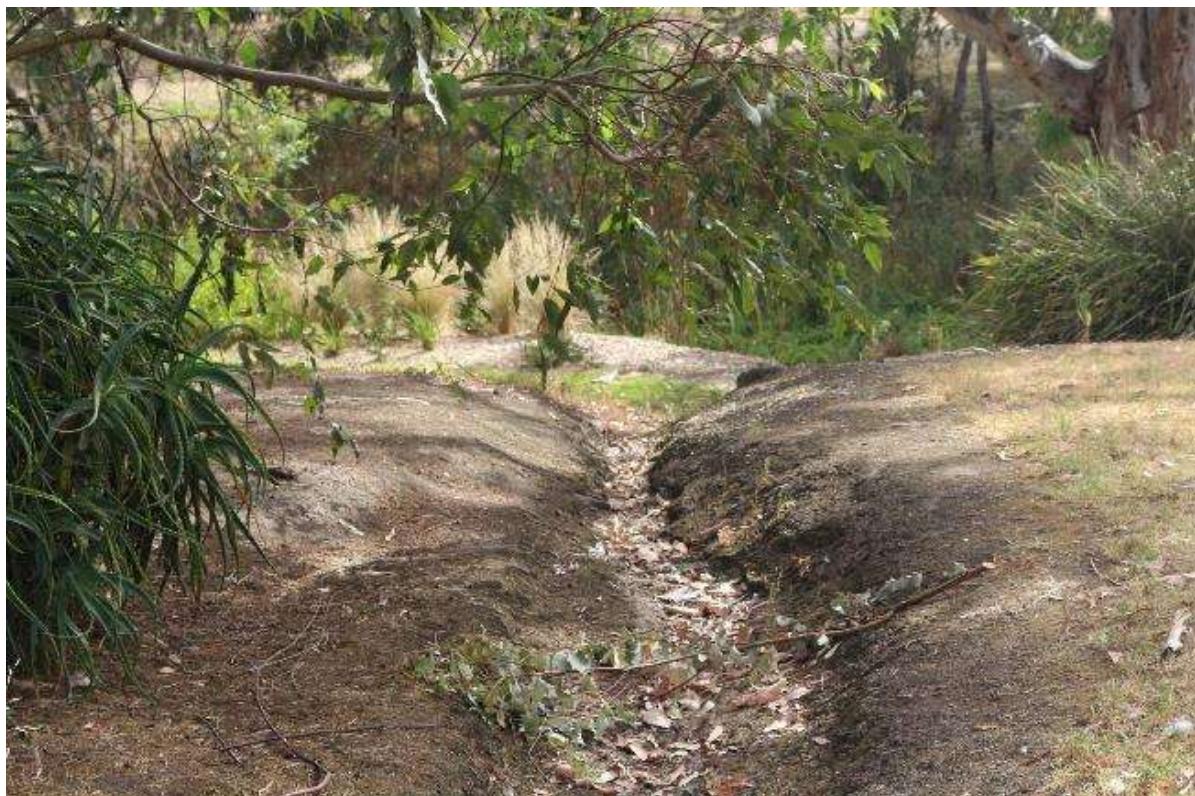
ERODING STORMWATER OUTLET, ARMYTAGE ST
